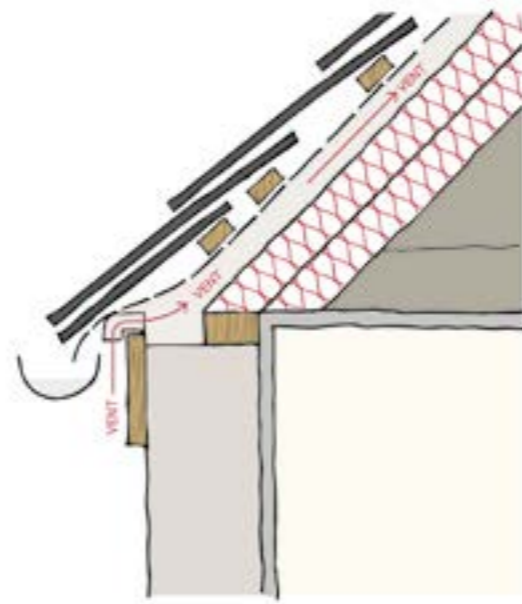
Ventilation for insulated pitched roofs should usually be provided at the eaves.
